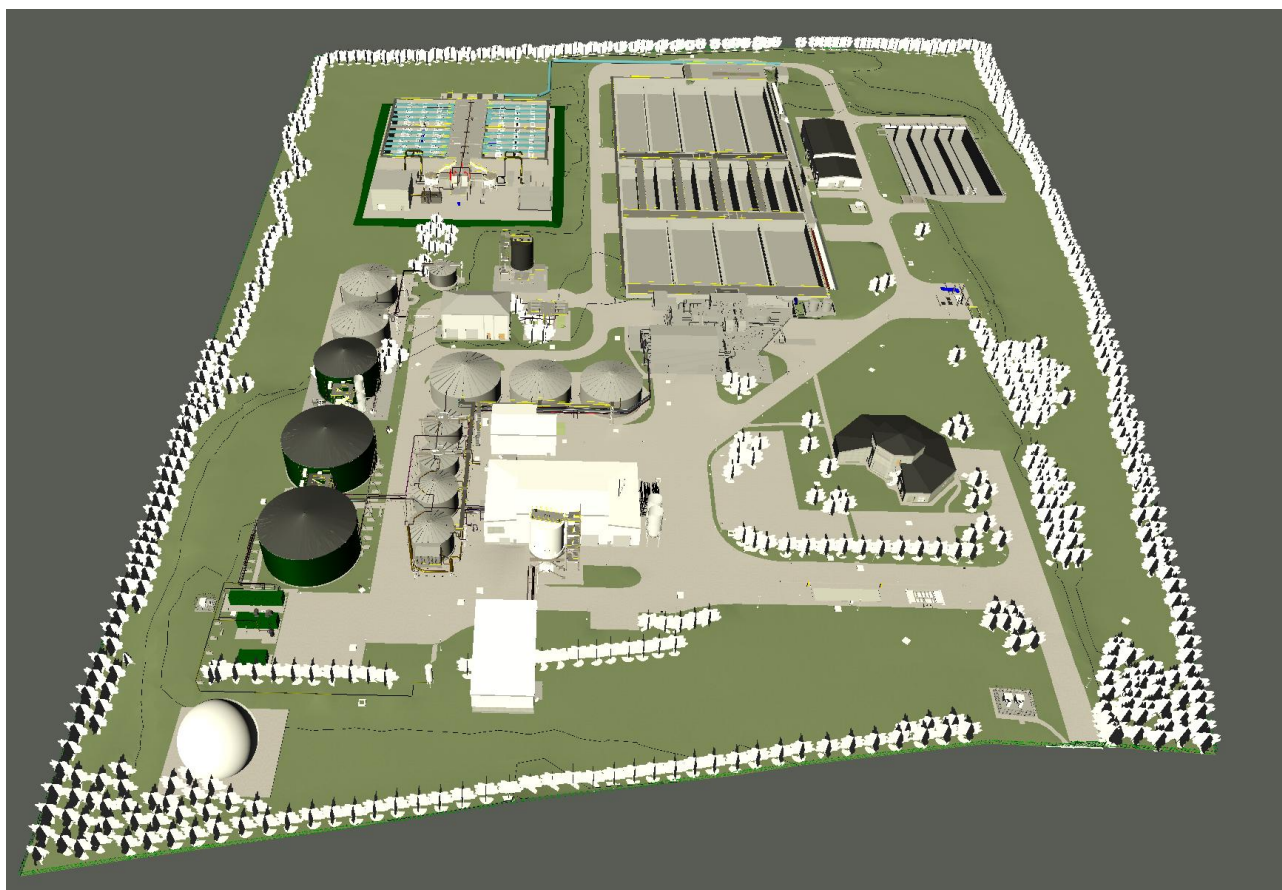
LIMERICK WWTP PROPOSED SITE LAYOUT (3D MODEL IMAGE)
